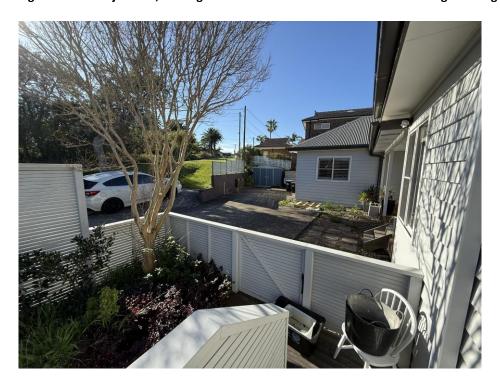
Looking north-west, the existing driveway and hardstand at the front of the site
